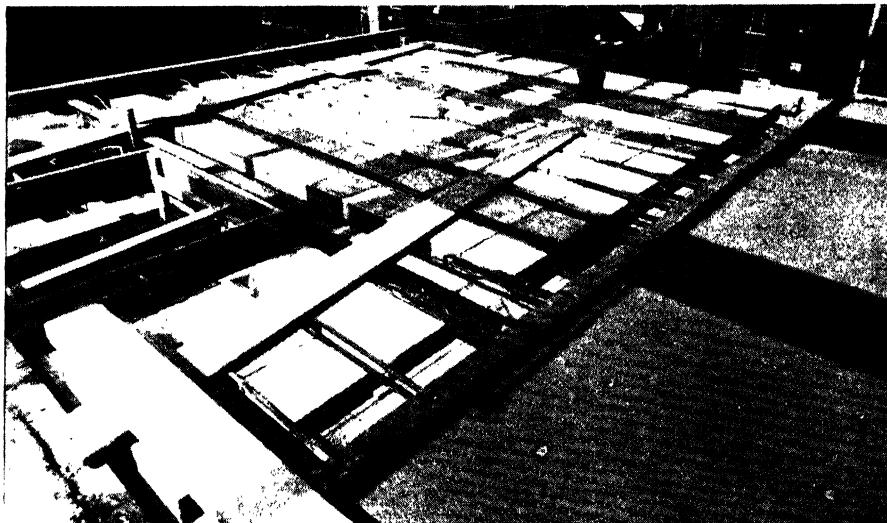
HOLLOW FLOOR CONSTRUCTION
